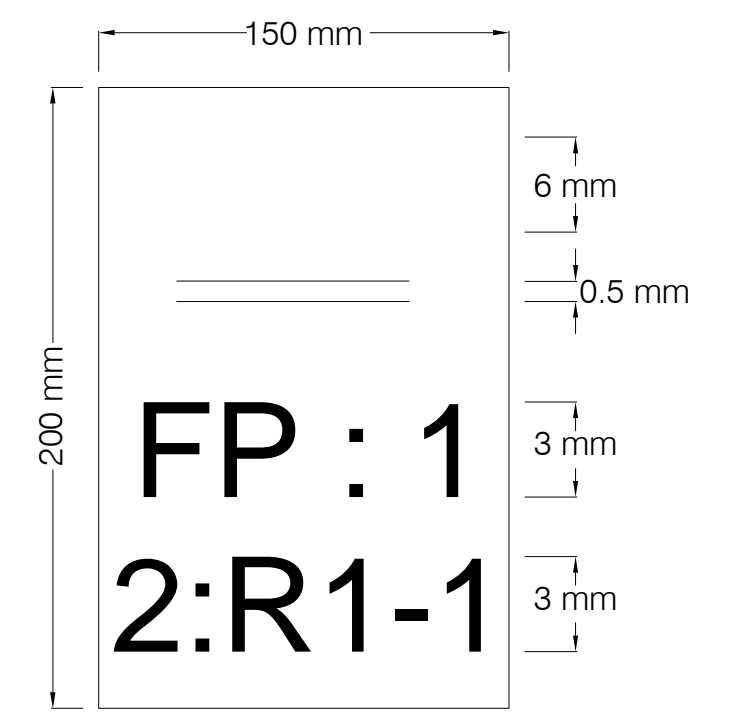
BASE BOARD FOR TERMINAL PANEL
